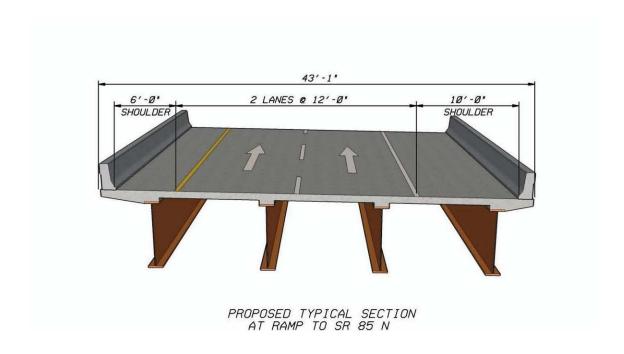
Proposed Typical Section (Ramp Over SR 85N)
